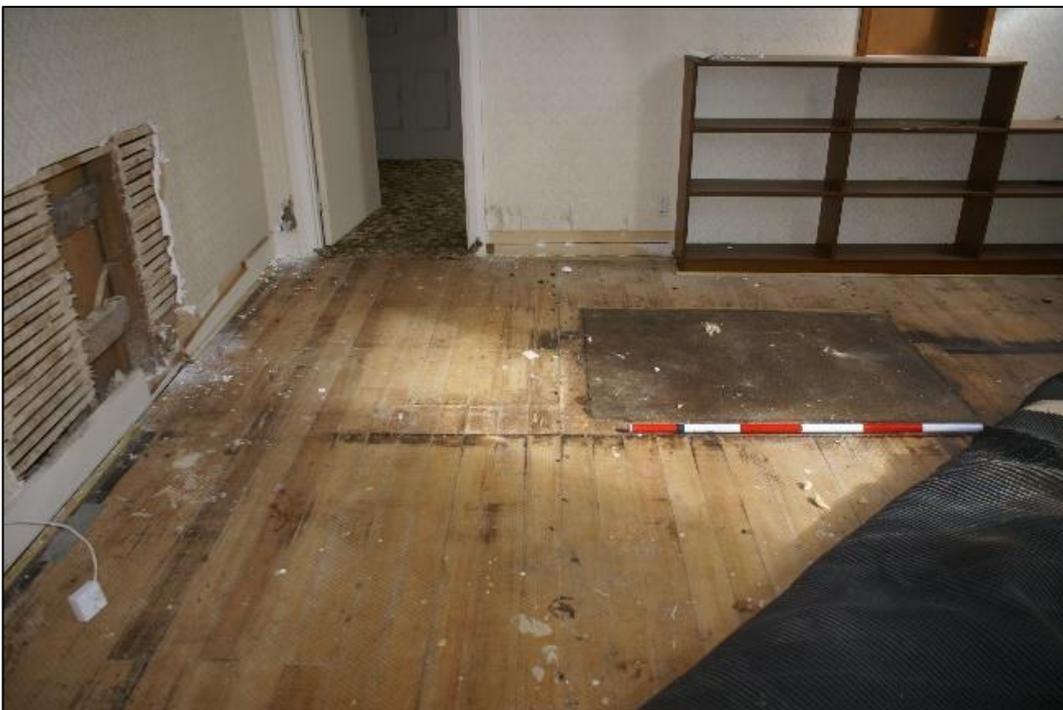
Looking north in Room 2 showing the original wall and doorway between Room 2 and 3 and the deconstructed fireplace along the original south wall of Room 3.
